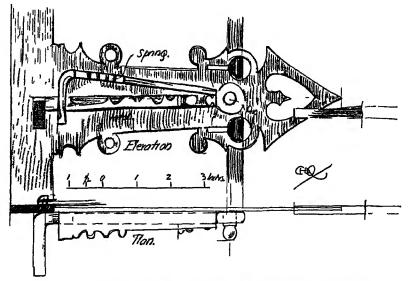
Casement Fastening, from a house in Guildford High Street.
